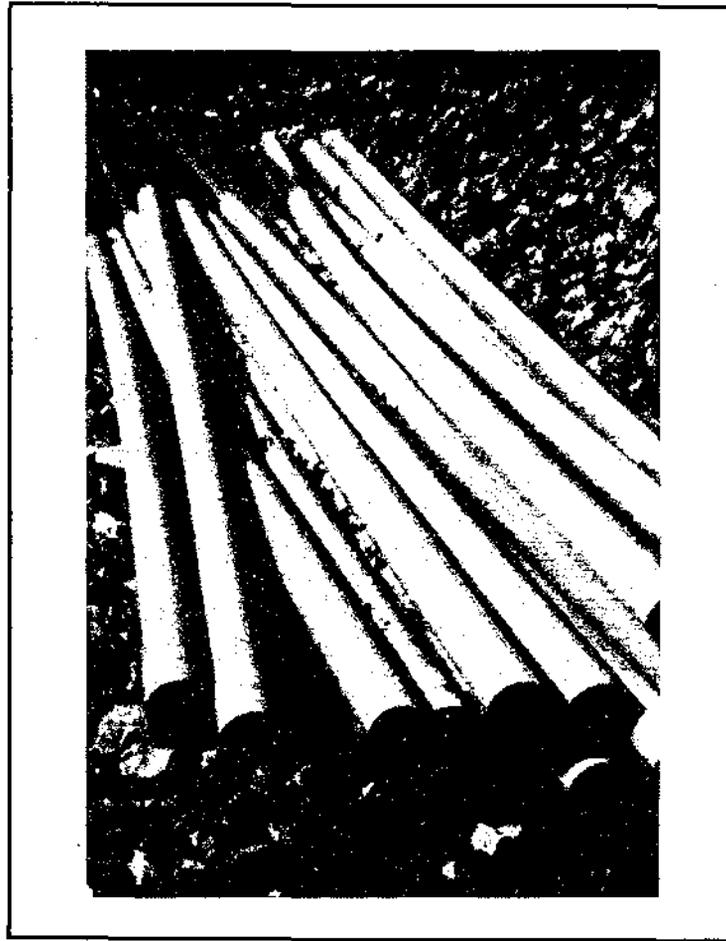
Photograph of PVC Pipe to be Used in a Landfill Leachate Collection System.
